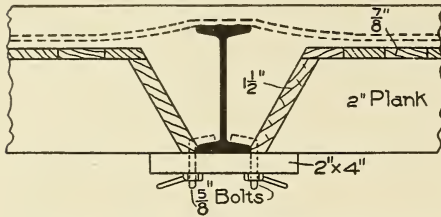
Form for Reinforced-Concrete Slab between I-Beams.
